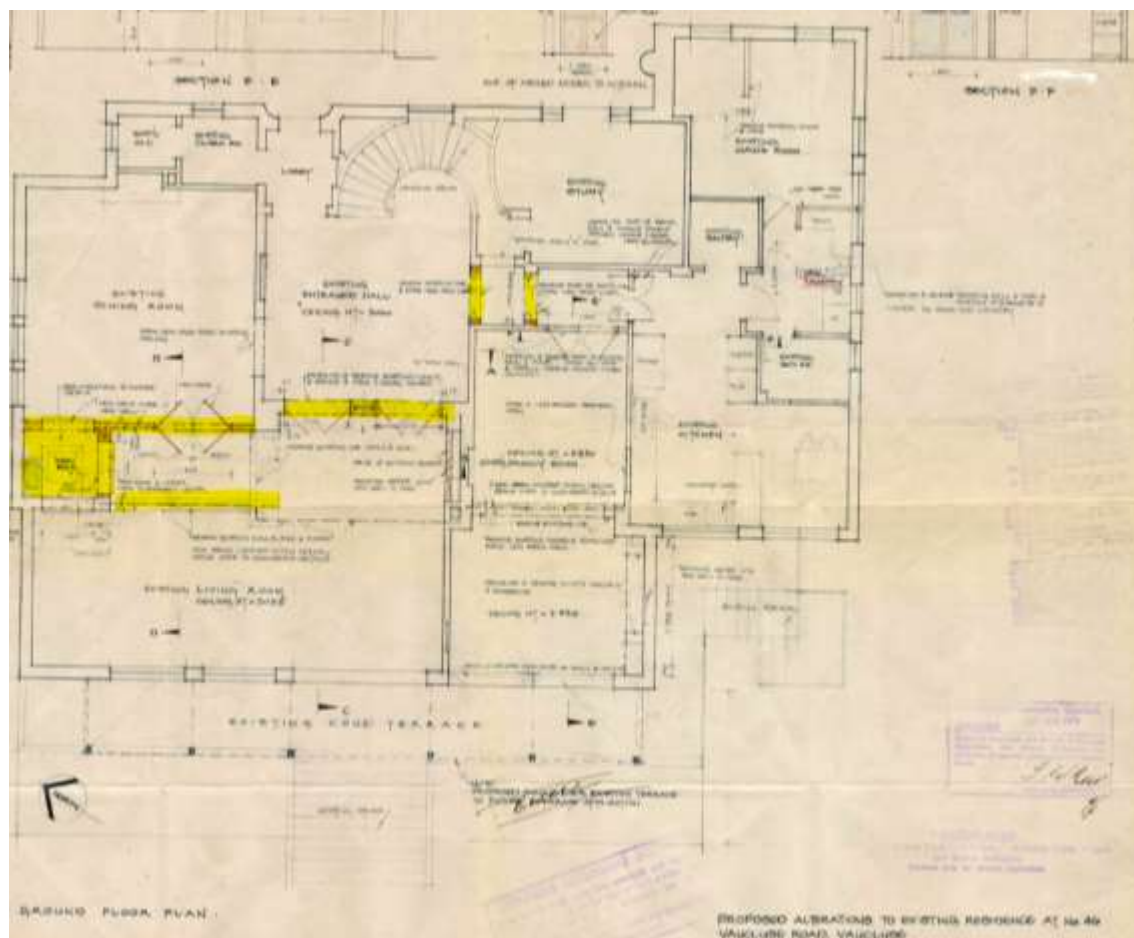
Kubany scheme ground floor plan, with works not carried out shown highlighted.
